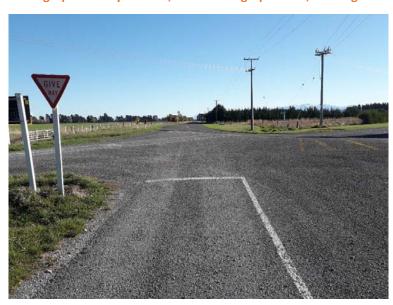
Bray Street Approach to Cardale Street Intersection
